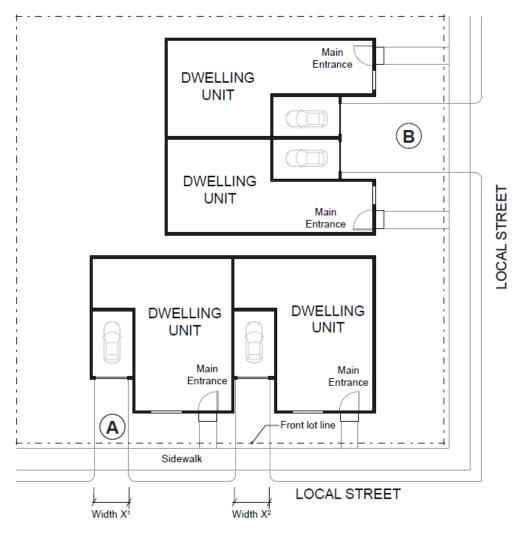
Driveway Approach Options for Multiple Local Street Frontages
